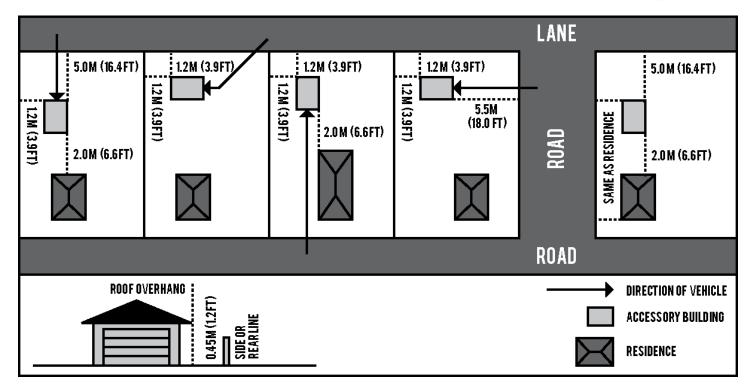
SITING OF ACCESSORY BUILDINGS
